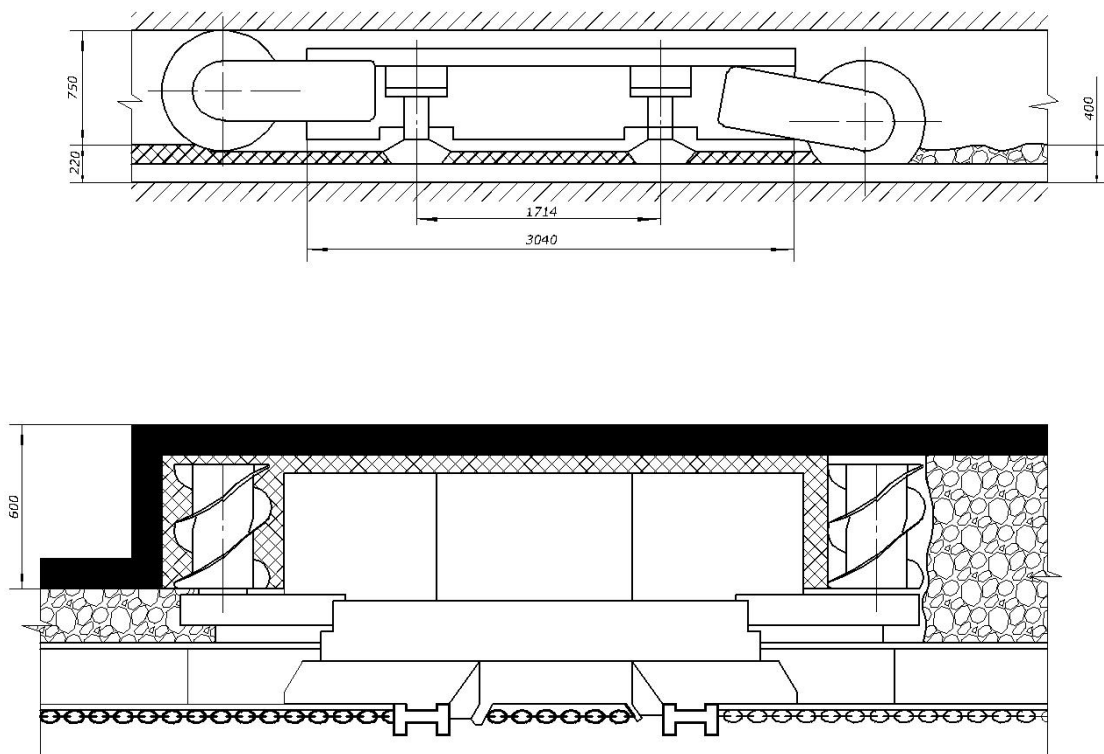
Separate Seam and Undercut Floor Rocks by Means of 1K103 Cutter-Loader
